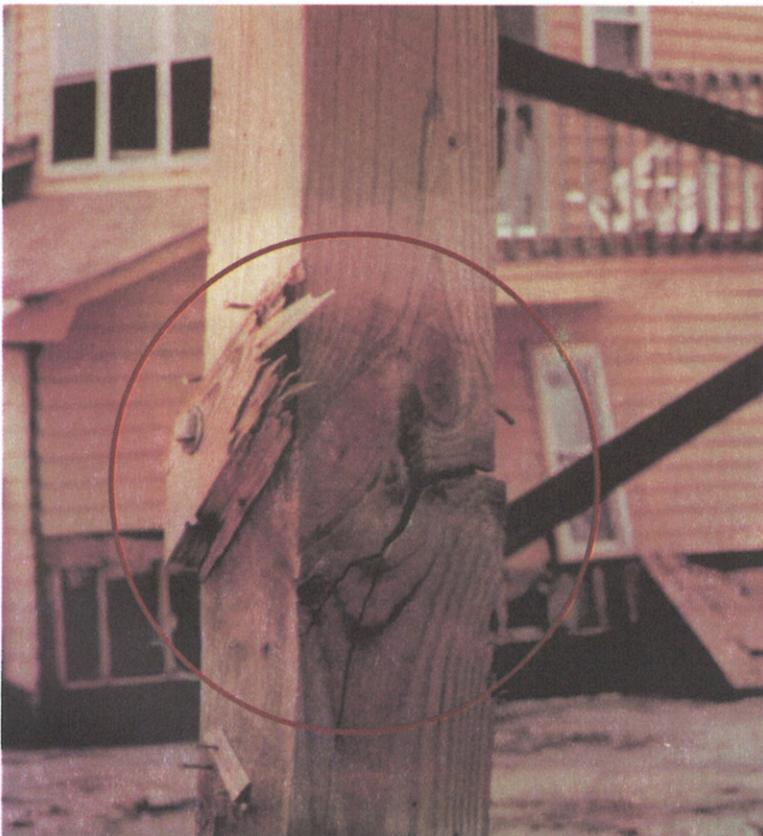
Example of broken piling. The piling broke at the location of several knots (circle), where cross-bracing was attached (note remaining bolt and piece of bracing).
